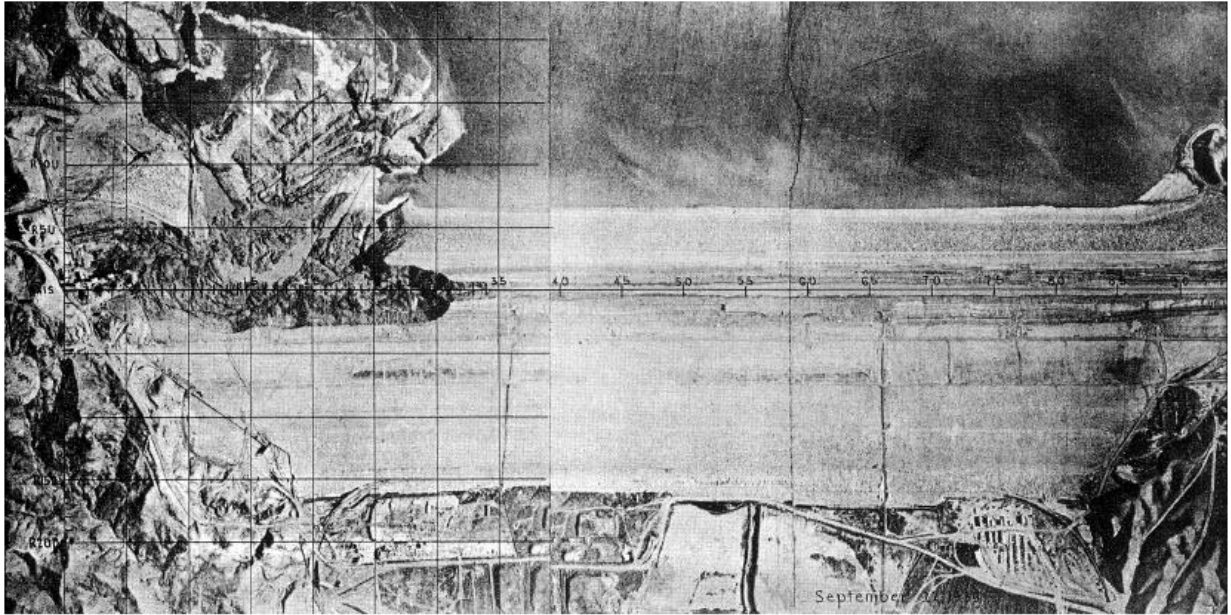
Aerial view of post failure geometry. (U.S. Army Corps of Engineers, 1939)
